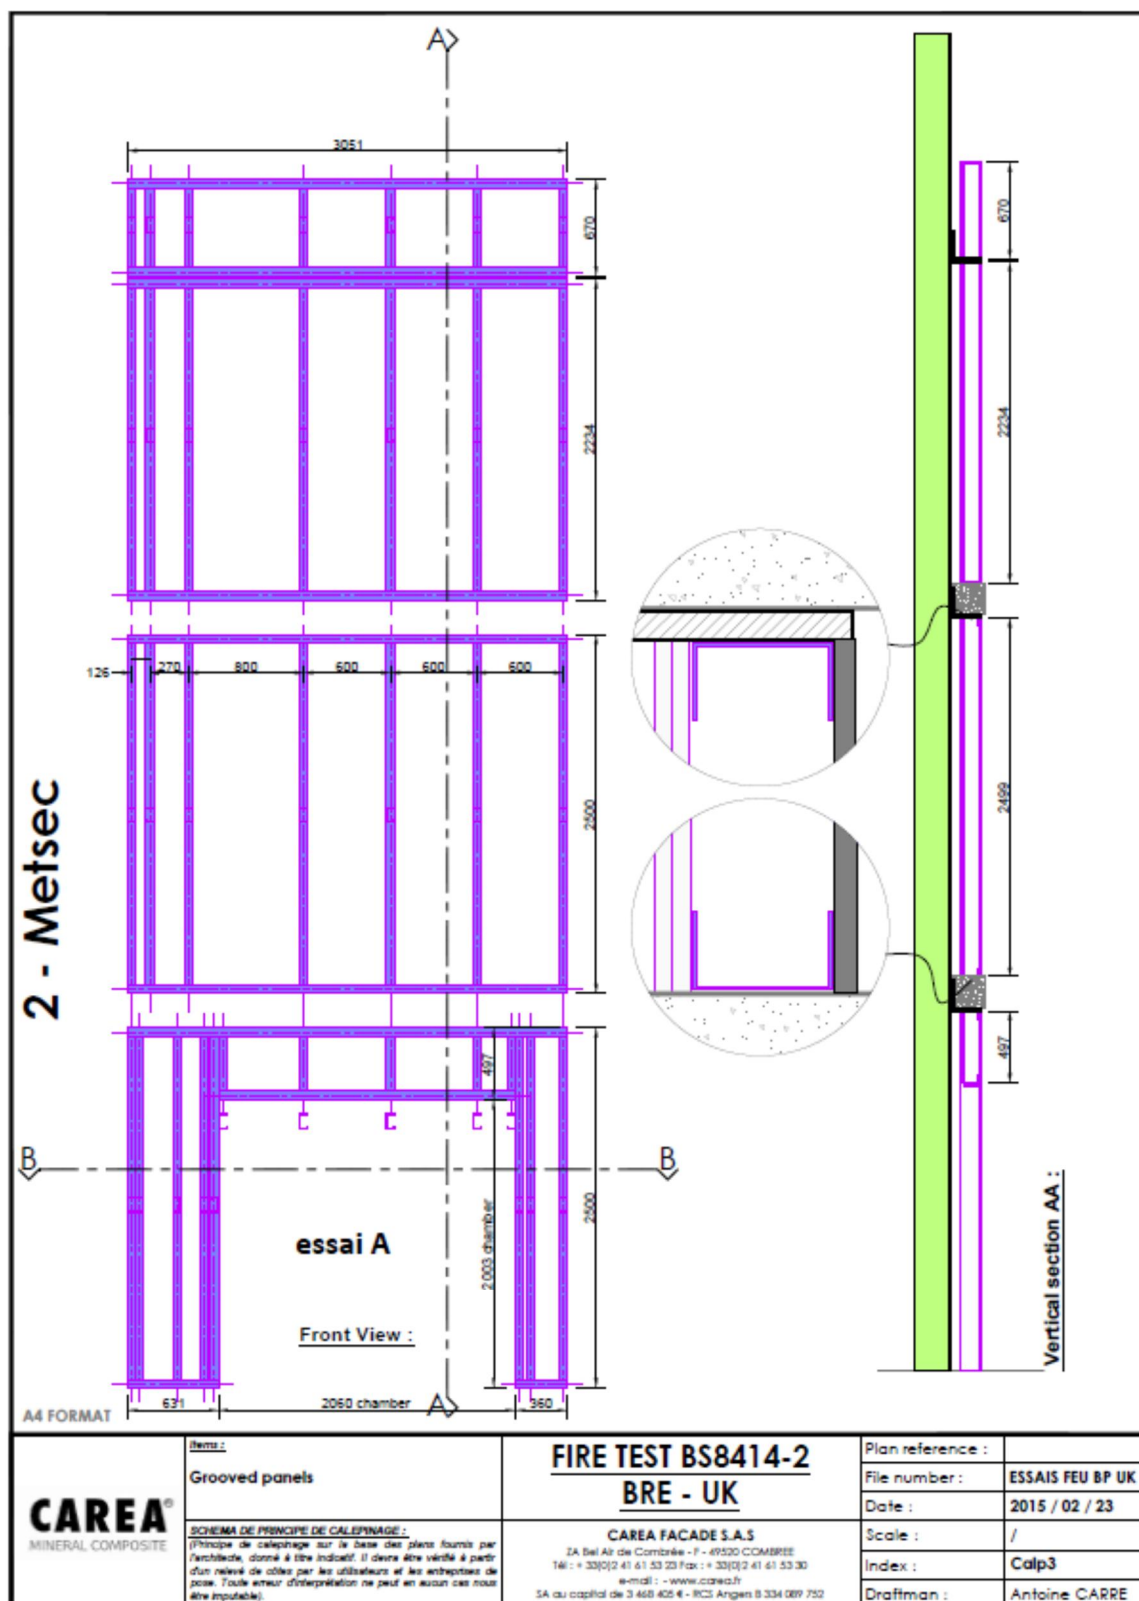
Front view and vertical section view of Metsec Layout – 2500mm floor heights with 600mm centres on uprights
